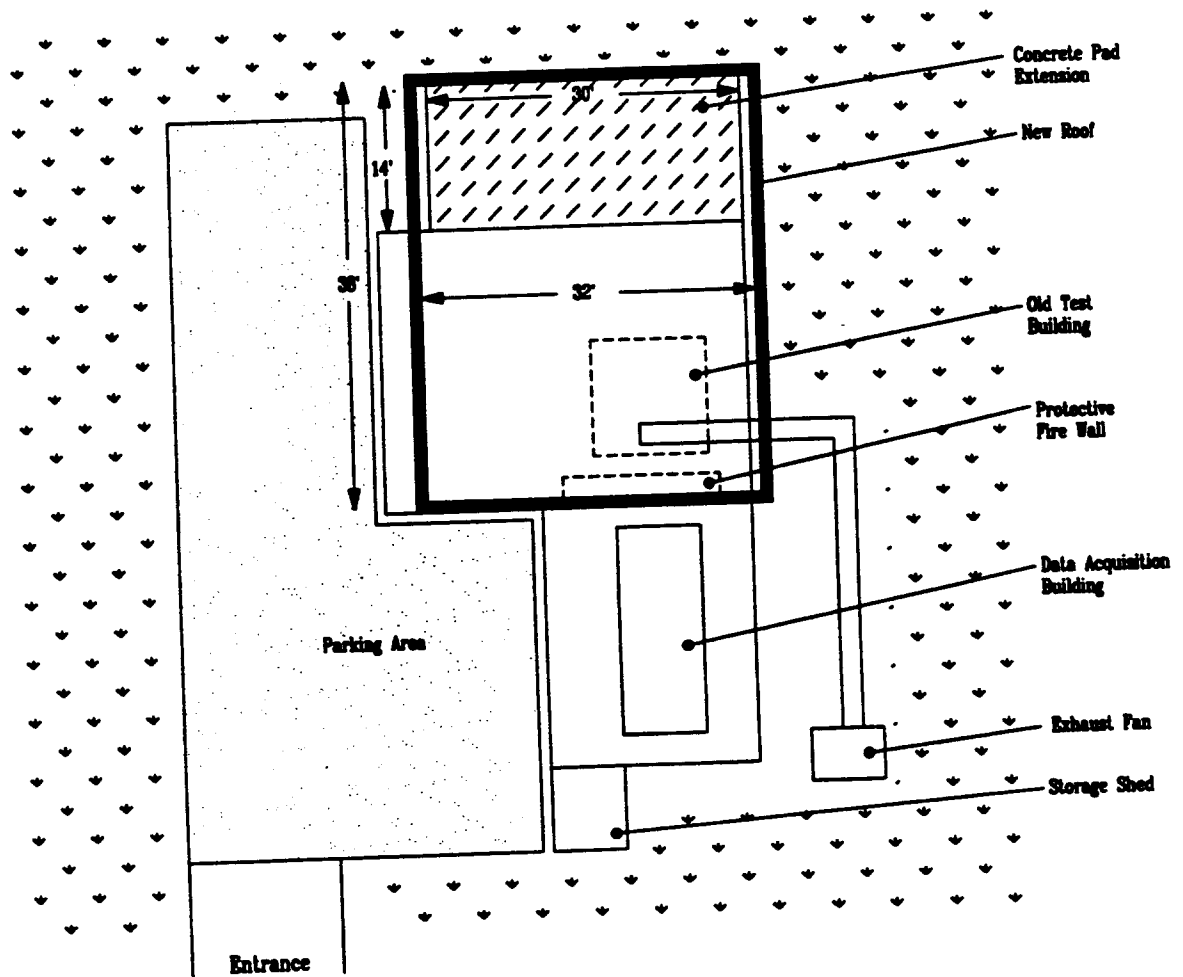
An overhead view of the fire facility showing the position of the new A-frame roof and the concrete pad extension.
